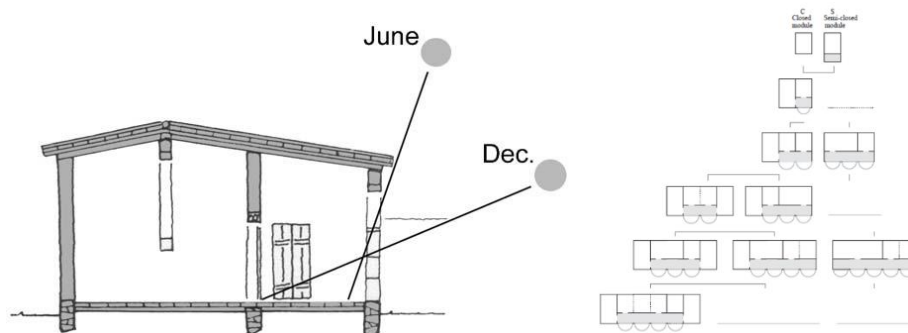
On the left section, on the right plan of (Outer arcade house type Turkish Cypriot house) (Dincyurek, Mallick, & Numan, 2003).
